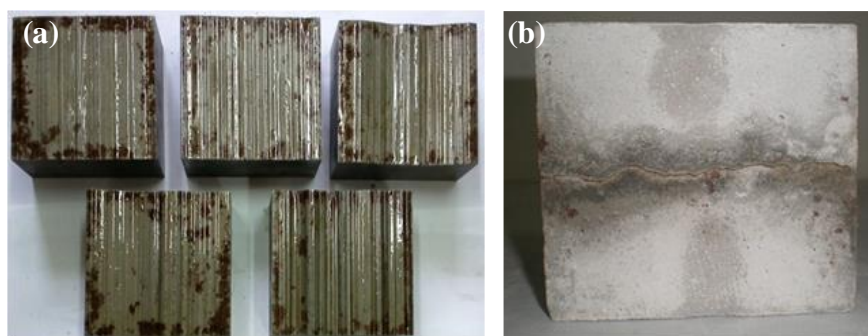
Part of steel mold and cement mortar specimen: (a) steel mold; (b) sample
